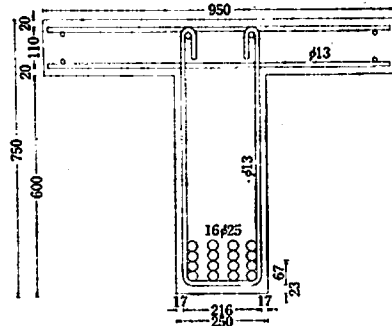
Cross-sectional dimensions of the test beams (mm).
